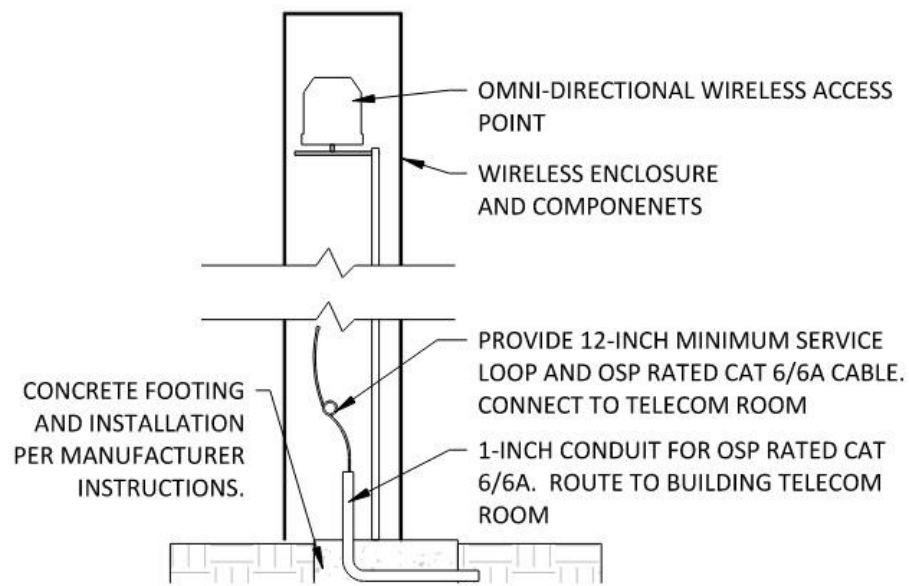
WAP Mounting – Wireless Bollard: This diagram shows a section cut through a typical wireless access point bollard installed on a concrete footing, per manufacturer instructions. A 1-inch conduit for OSP rated CAT 6/6A cable will route to the building telecom room. The cable shall have a 12-inch minimum service loop. The omni-directional WAP will be installed within the enclosure.
